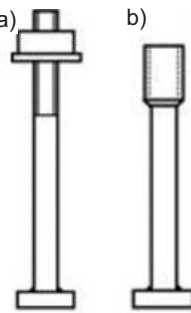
Anchors with a head that should be embedded in concrete in the reinforced concrete element [10] (description in the article)
